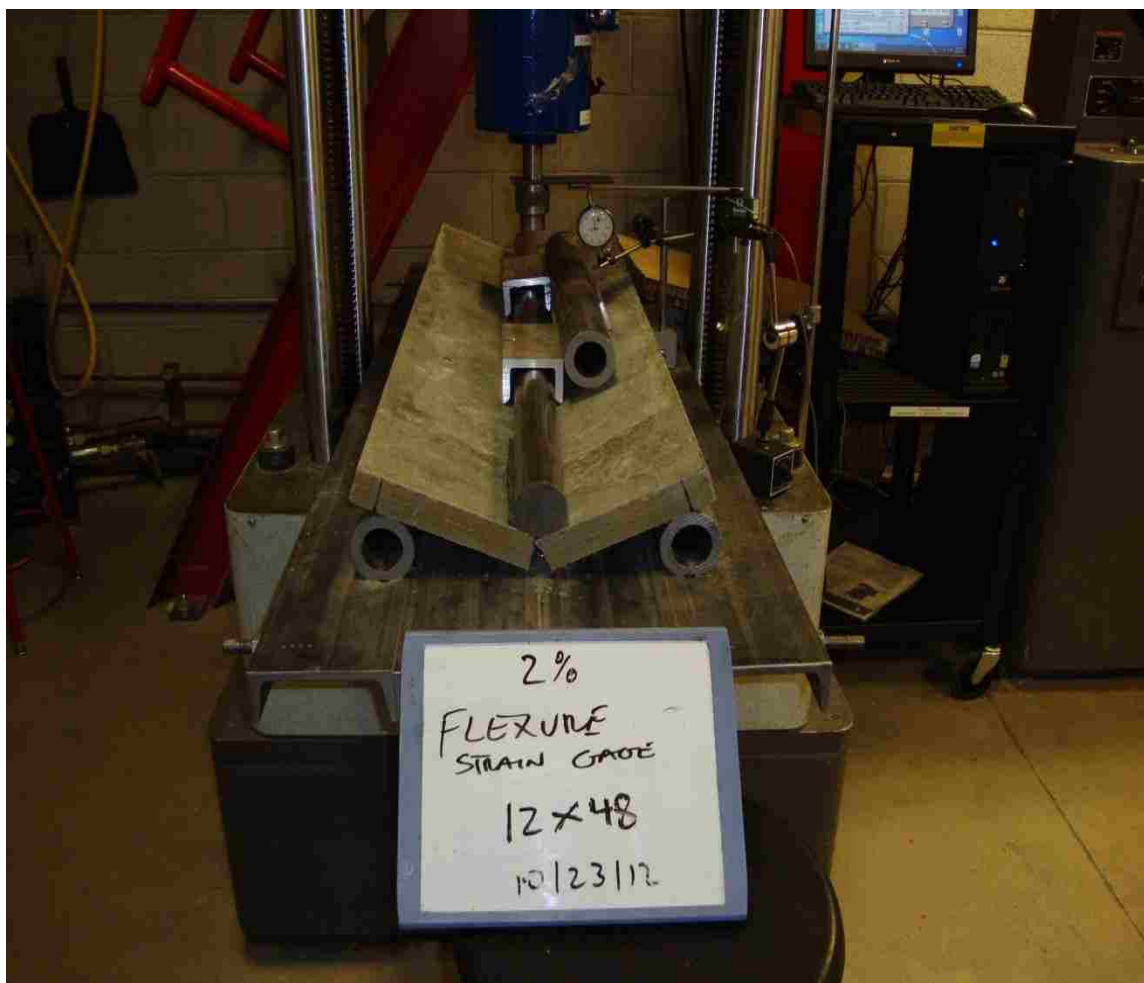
Failure patterns for short span 2% HSSFRC rectangular plates under longitudinal line load
